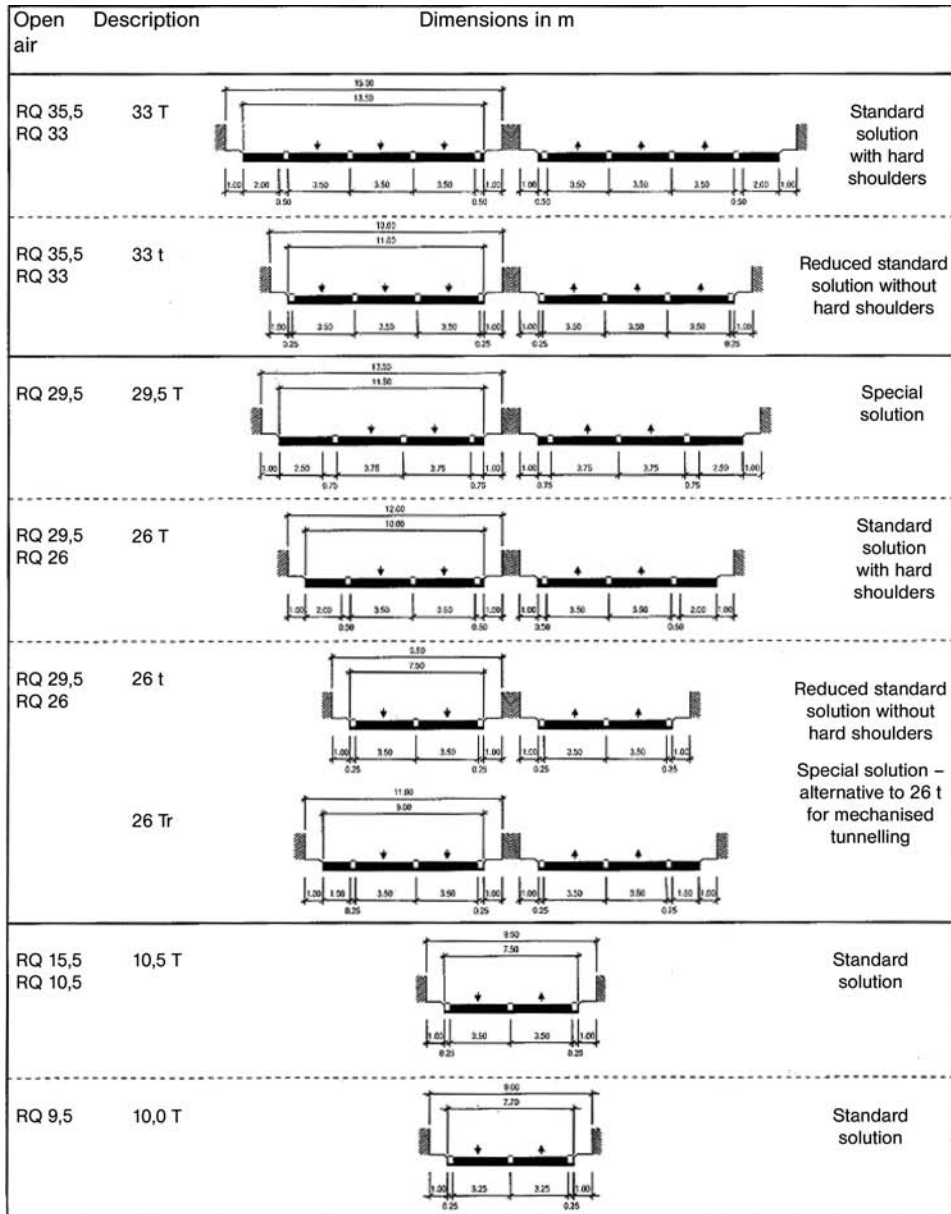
Standard cross-sections for road tunnels [33, 77].
